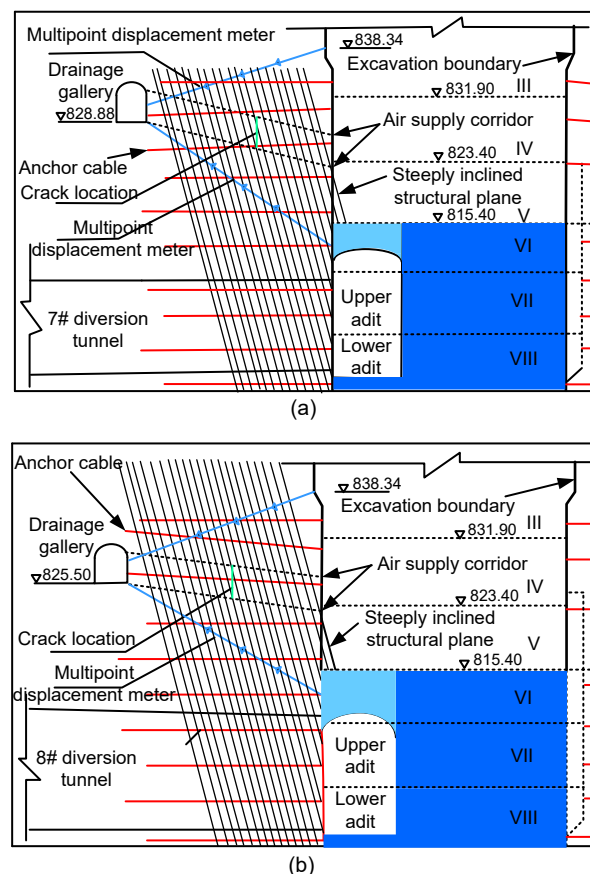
Excavation of L3 construction adit at hydraulic turbine sets 7 and 8: (a) No. 7; (b) No. 8 (unit: m)
